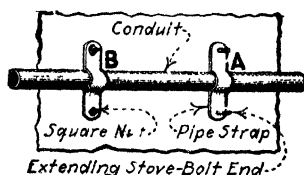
Attachment with anchored stove bolt. At A the stove bolt ends are shown extending. At B the nuts have been put on and the surplus bolt ends cut off.
